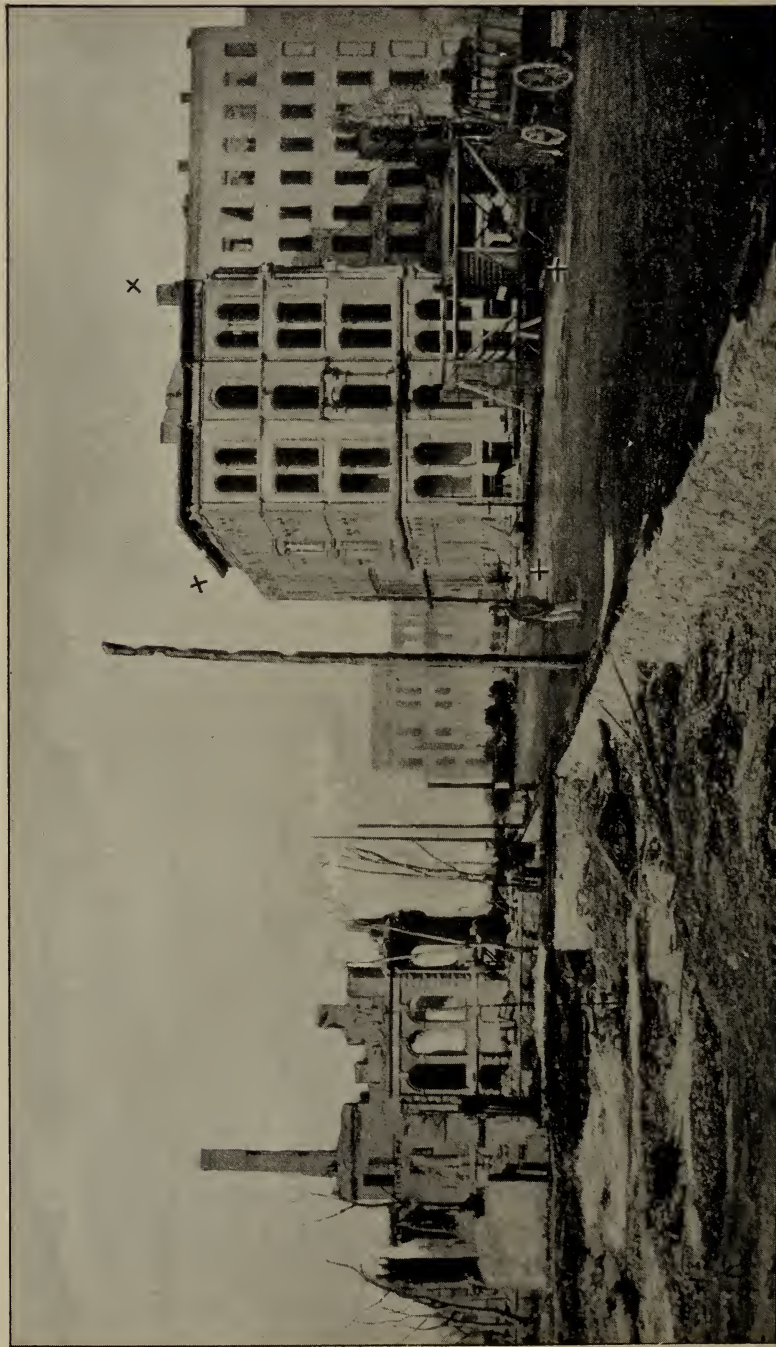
PLATE I.—Building N. E. corner Monroe and LaSalle Streets, Chicago. View taken immediately after the great Chicago fire. The building was structurally unimpaired.
